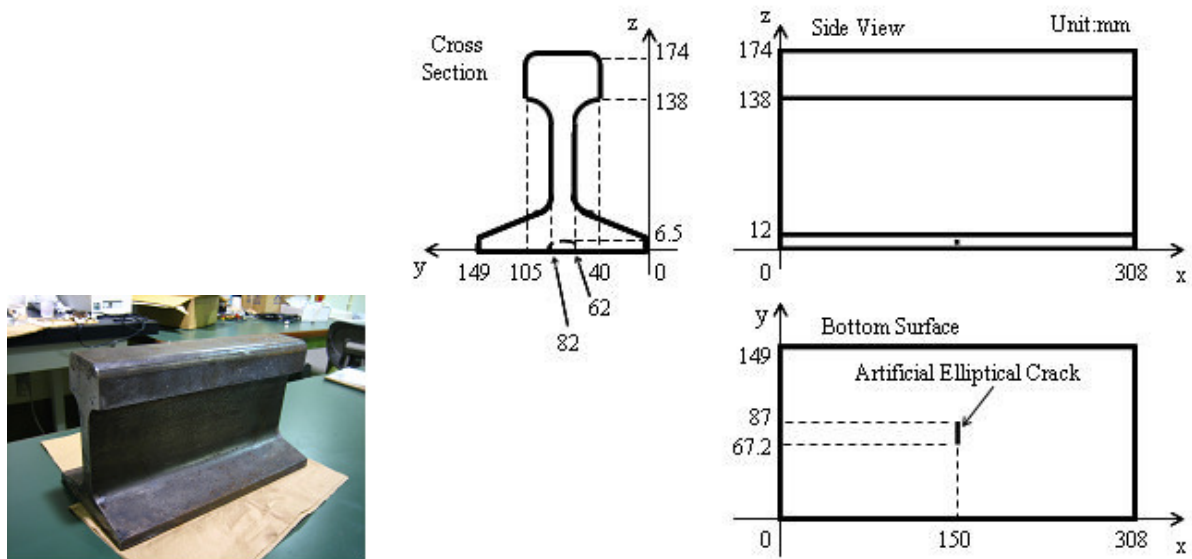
Photograph of the specimen (left) and size of the specimen (right).
